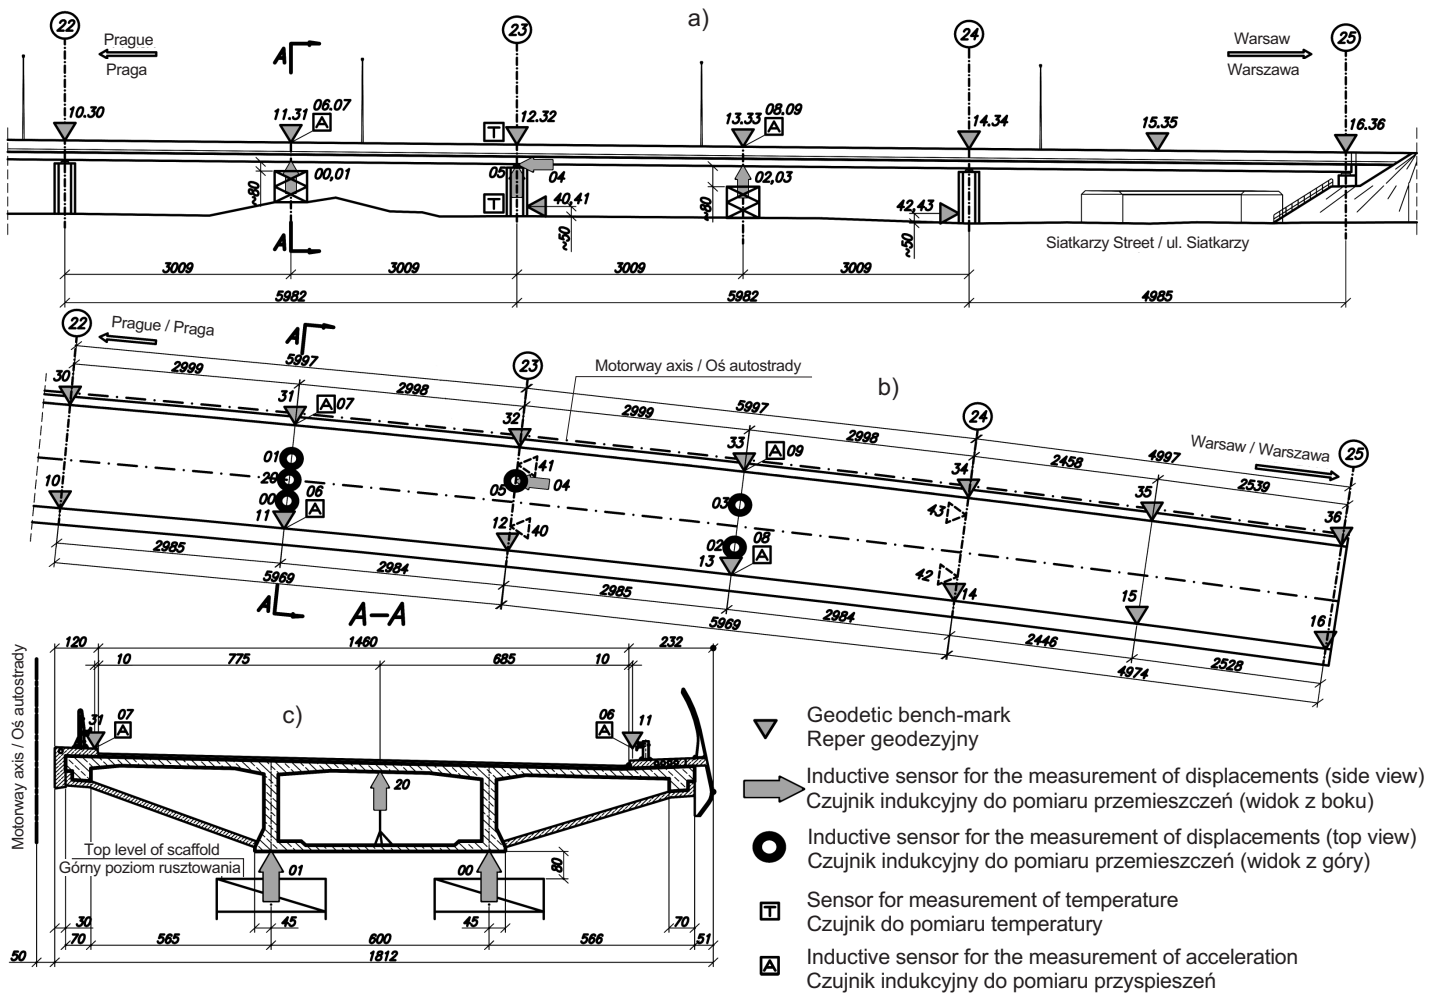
Location of measuring points: a) side view, b) top view, c) cross-section in the middle of span 22-23
